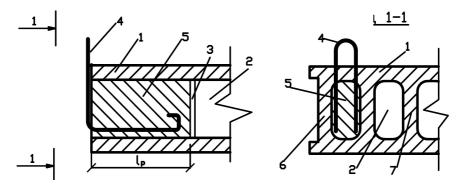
Installation scheme of one-sided anchor loop: 1 – hollow slab; 2 – void (channel); 3 – partition; 4 – loop with unilateral anchors; 5 – reinforced concrete; 6 – extreme rib; 7 – middle rib
